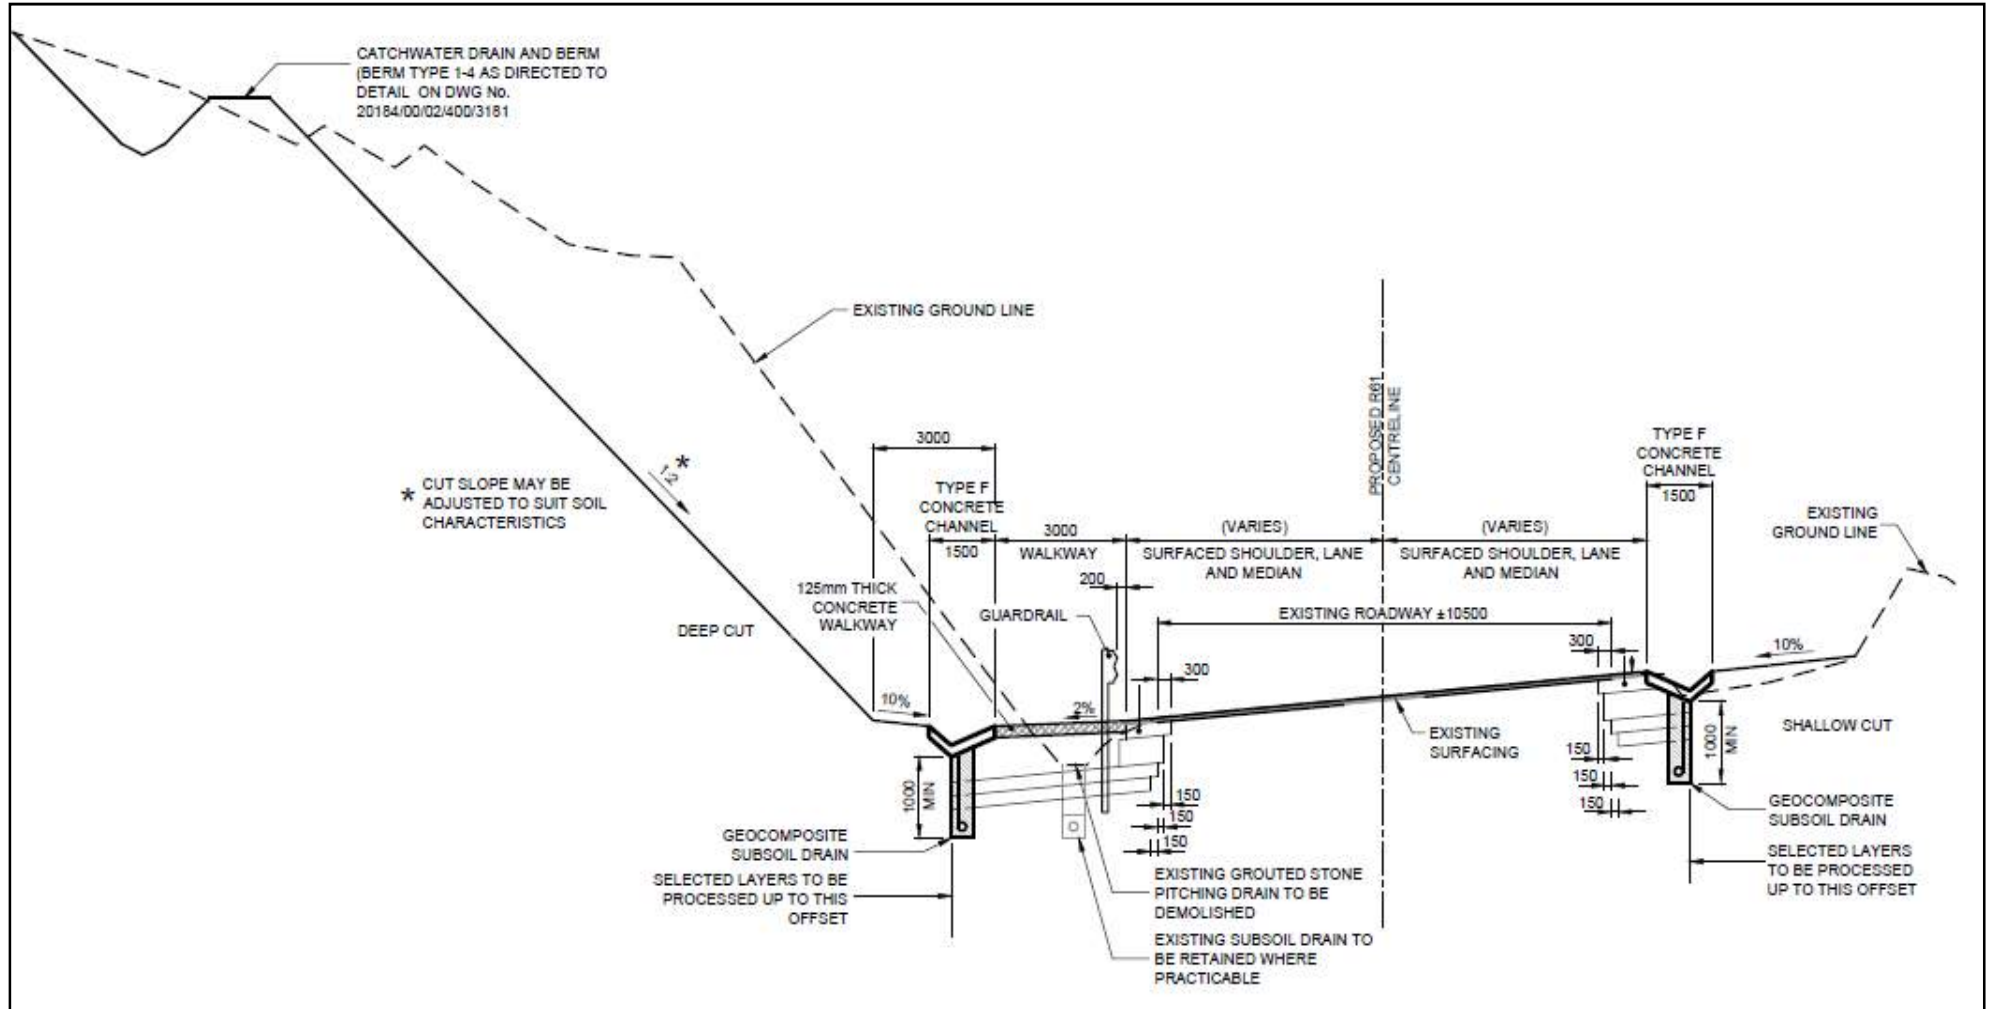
Intersection Widening – Cut Condition (Note: Final pavement layer works – refer Section 8).
